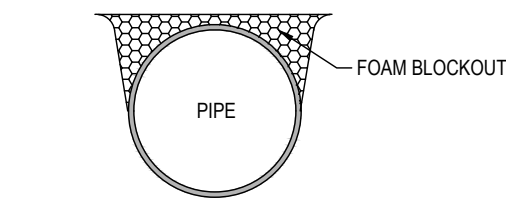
G: EXCAVATE AROUND MAIN & ATTACH BLOCKOUT
